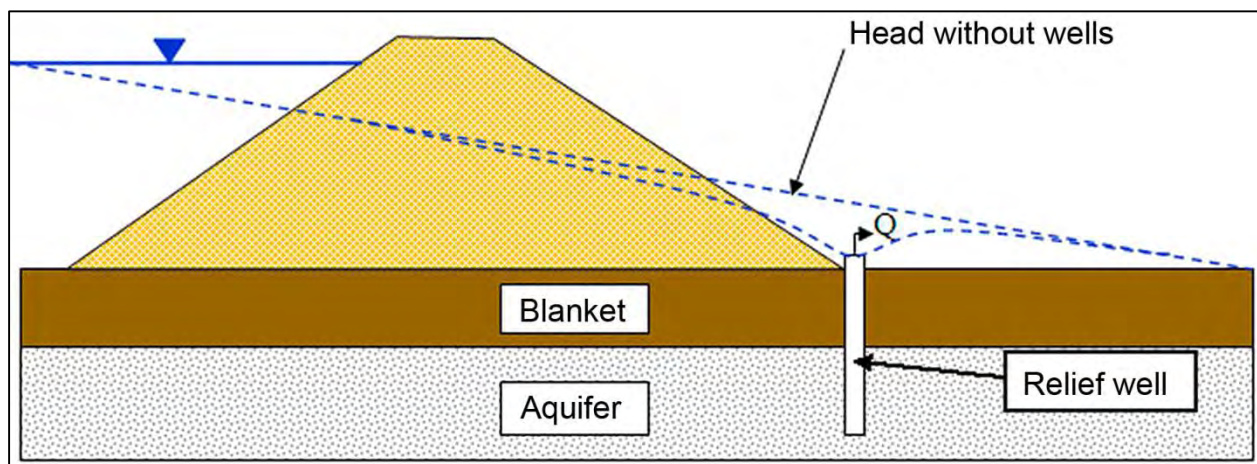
Typical relief well installation for blanket-aquifer foundation.
